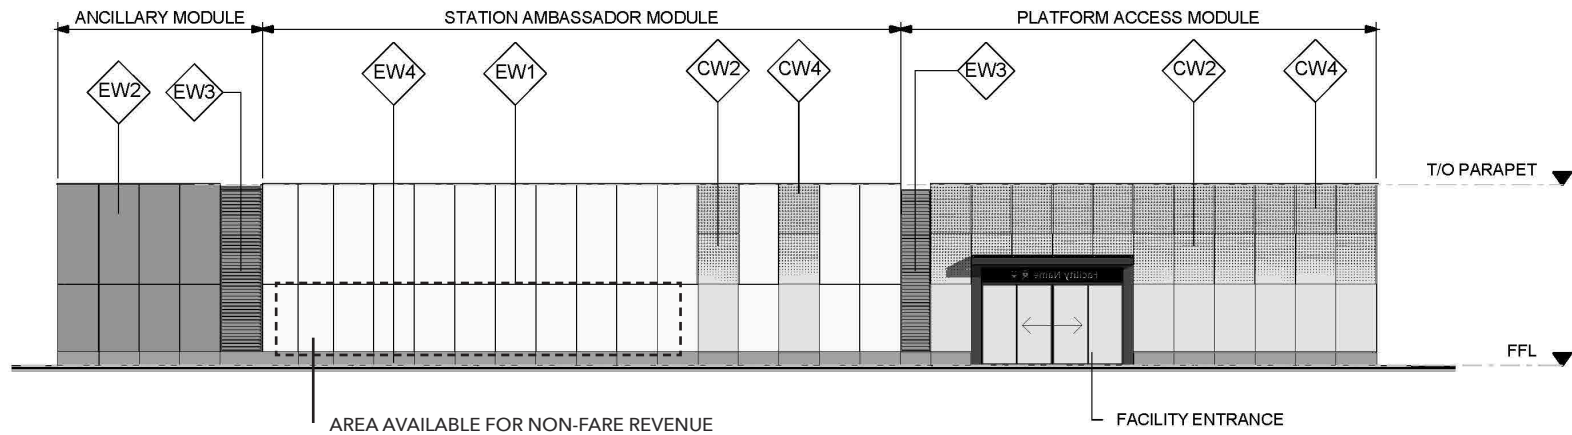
Staffed Station building with Tunnel platform access. Platform Elevation.
